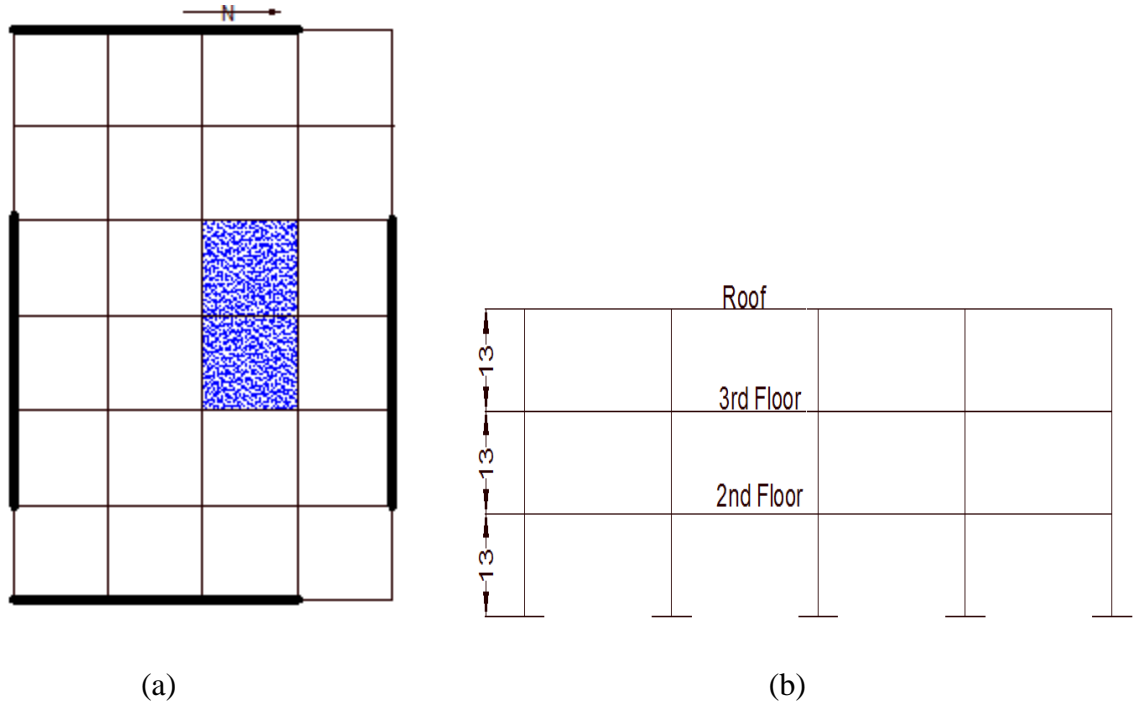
Plan view (a) Elevated view (b) of the typical three-story frames for Los Angeles with the penthouse indicated by the shaded area.
